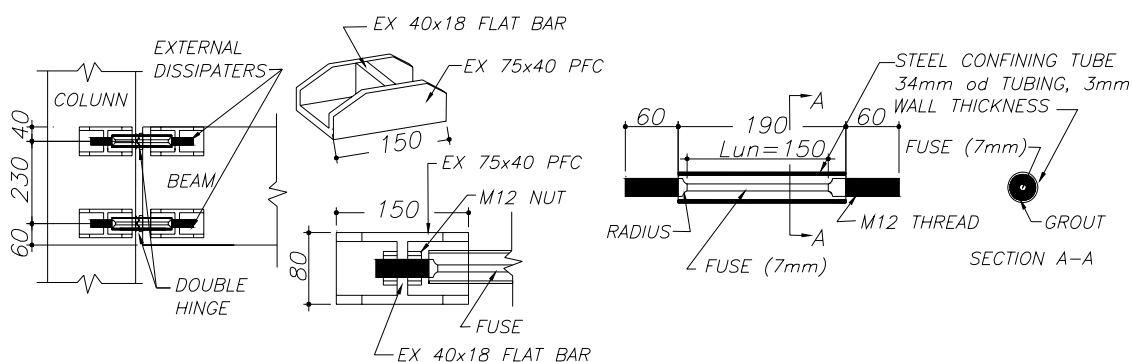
Energy dissipater footing (left) and rods (right) used in HJ2 Specimen.
